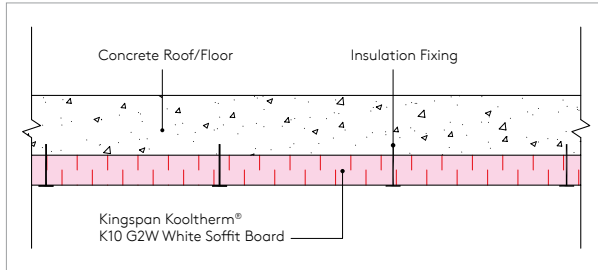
Side elevation - Concrete Soffit with Kingspan Kooltherm® K10 G2W White Soffit Board.
